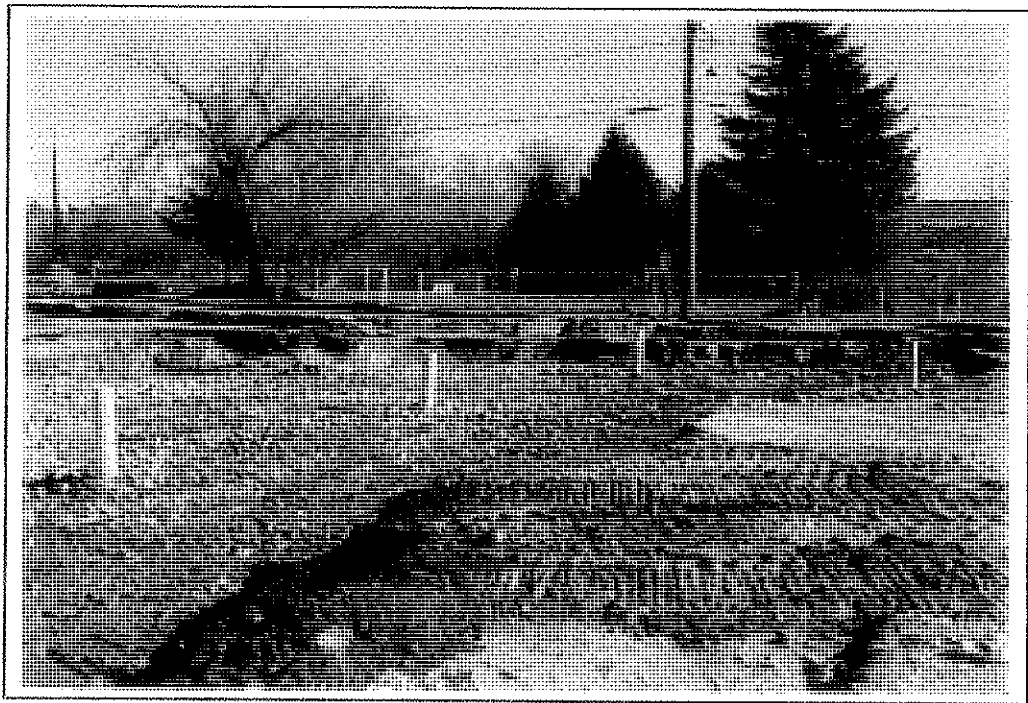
Backfilling with quarry spalls and installation of four temporary wells completed.
